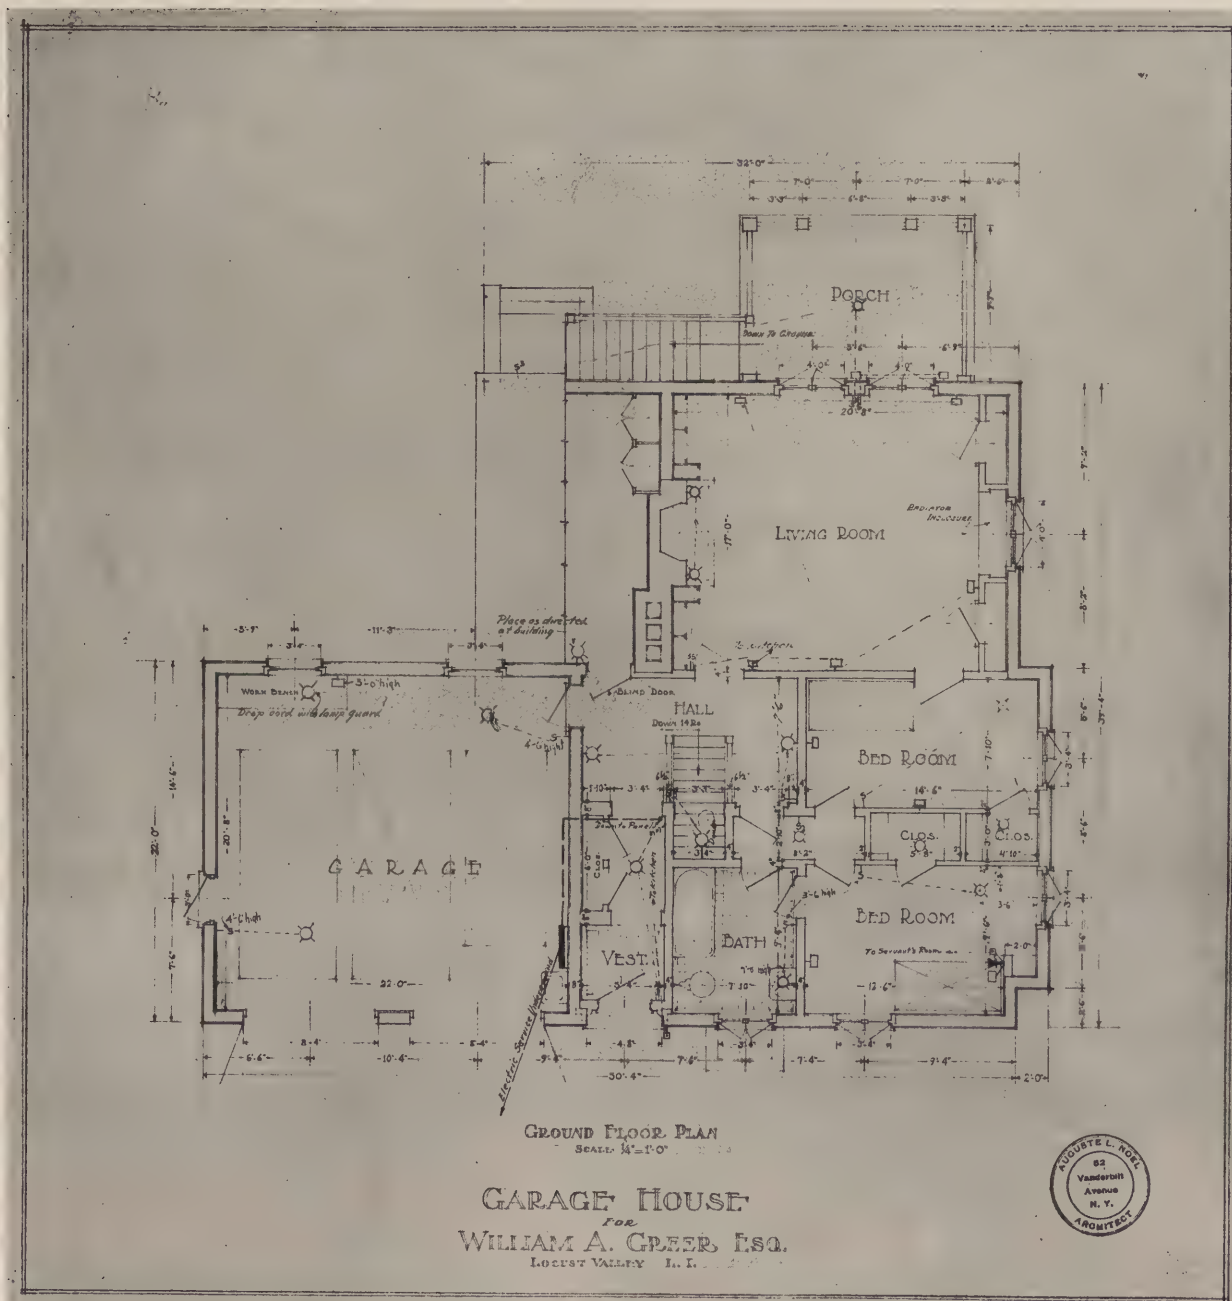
Working Drawing, Ground Floor Plan Developed from the Studies Shown in Figure 6.
